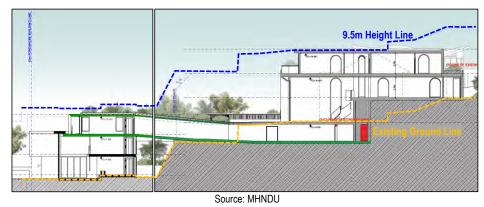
Long Section C Through the Proposed Dwelling (East & West Wings)
